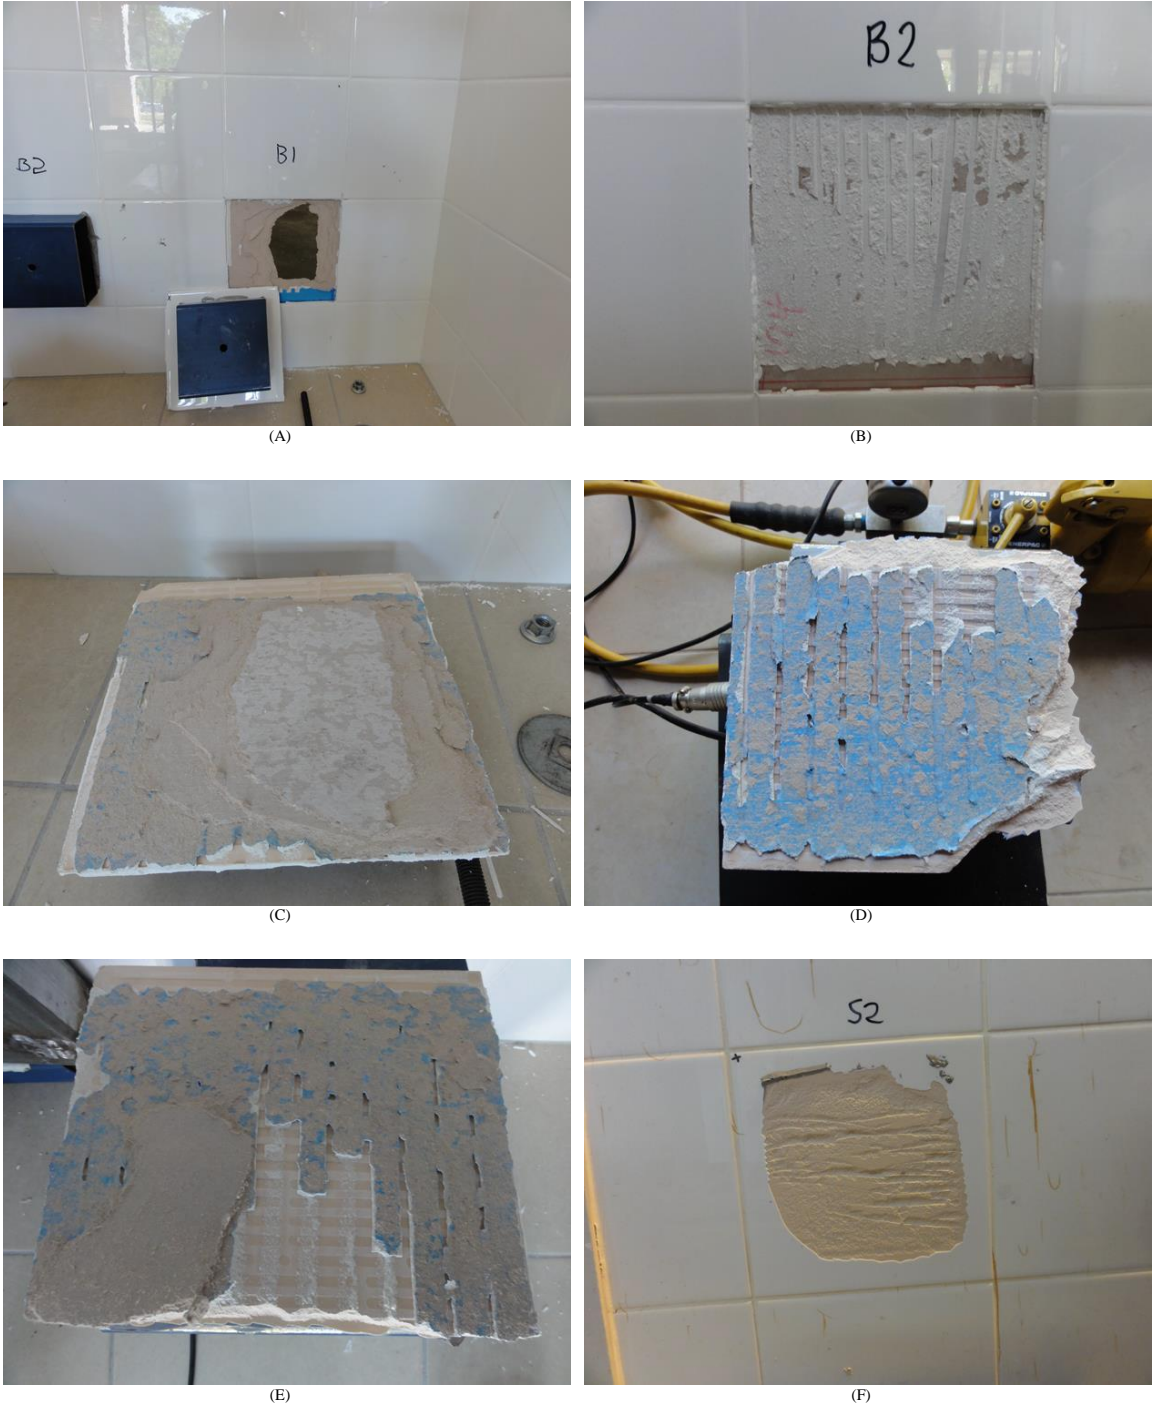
SAMPLES AFTER PULL-OUT TESTS ON WALL TILES
